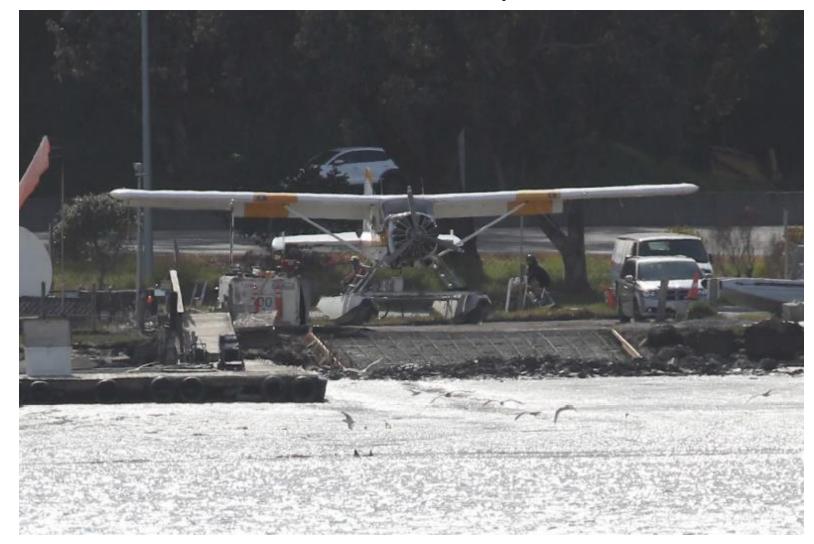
C. March 14, 2022. Photograph 2 depicting unauthorized excavation and rebar and concrete ramp construction.
